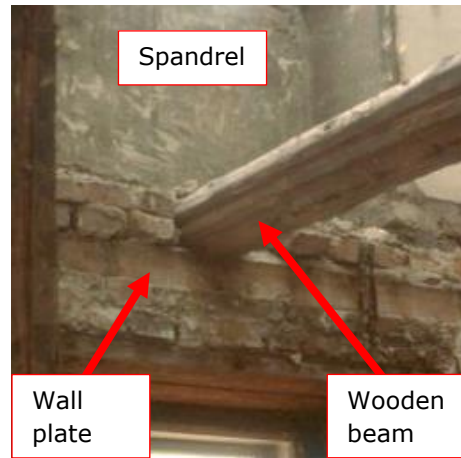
Wooden beam supported by a wall plate in between masonry columns, seen from below.
